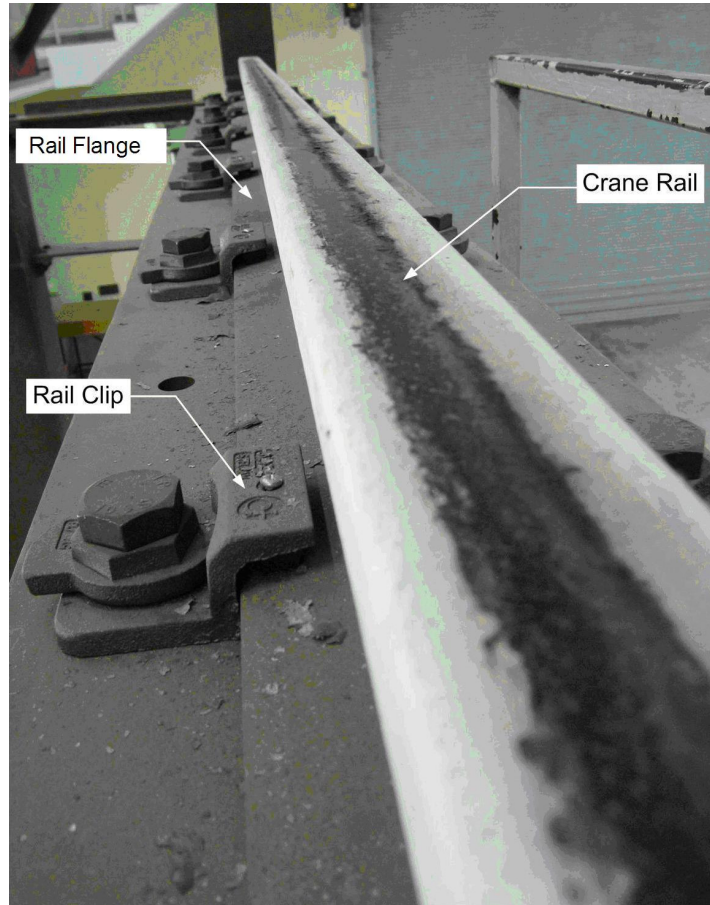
Crane Rail on Gantrax pad fixed to crane girder
